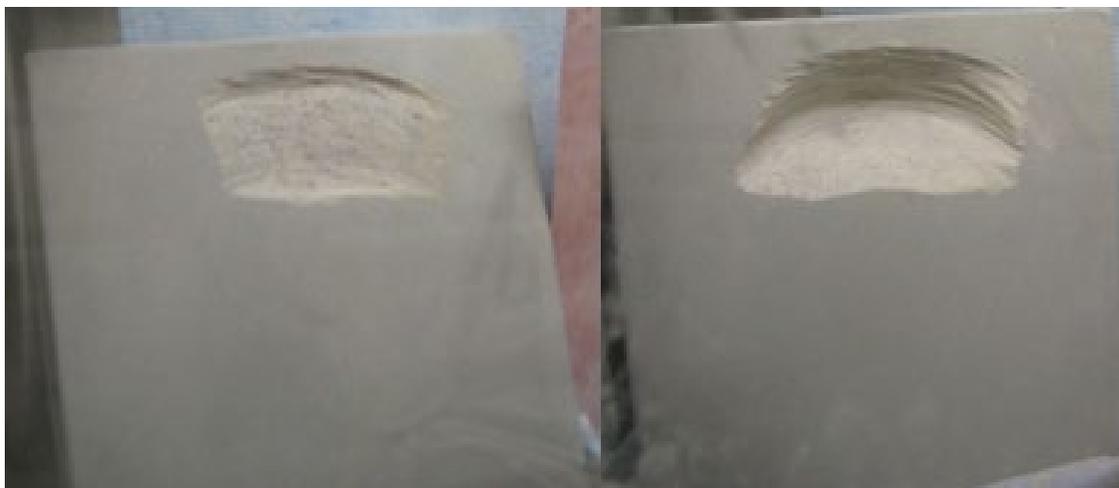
Sealed Concrete Ground to 0.25 in. (left) and 1 in. (right)
